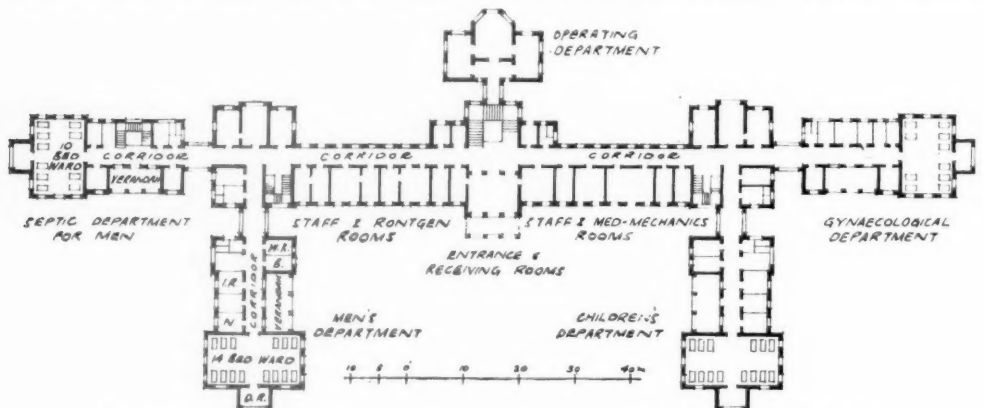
KARLSRUHE MUNICIPAL HOSPITAL: GROUND FLOOR PLAN OF THE SURGICAL DEPARTMENT
